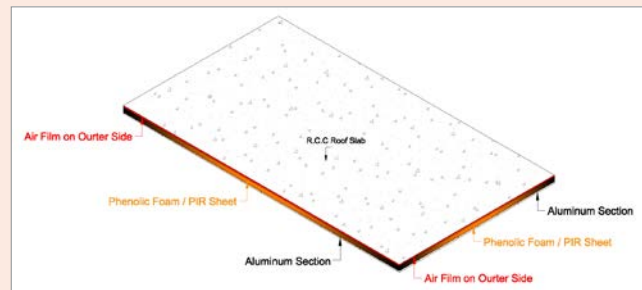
Underdeck insulation with phenolic foam / PIR sheet for R.C.C. roof slab
